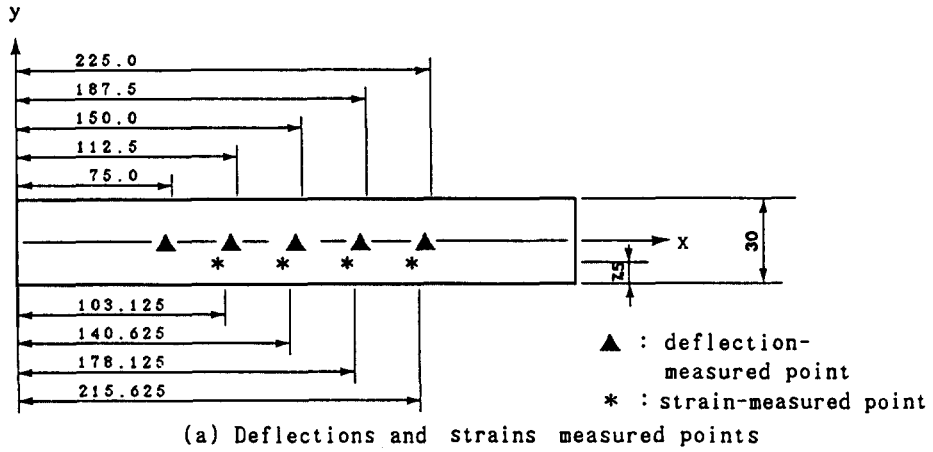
Cantilever beam with T cross-section under concentrated load P at center of free edge
